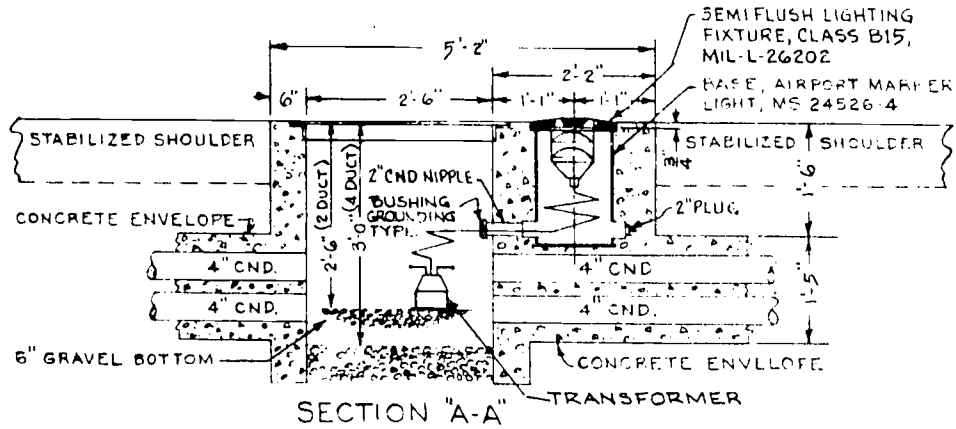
Runway edge light fixture and handhole installation in runway shoulder. 73.331
